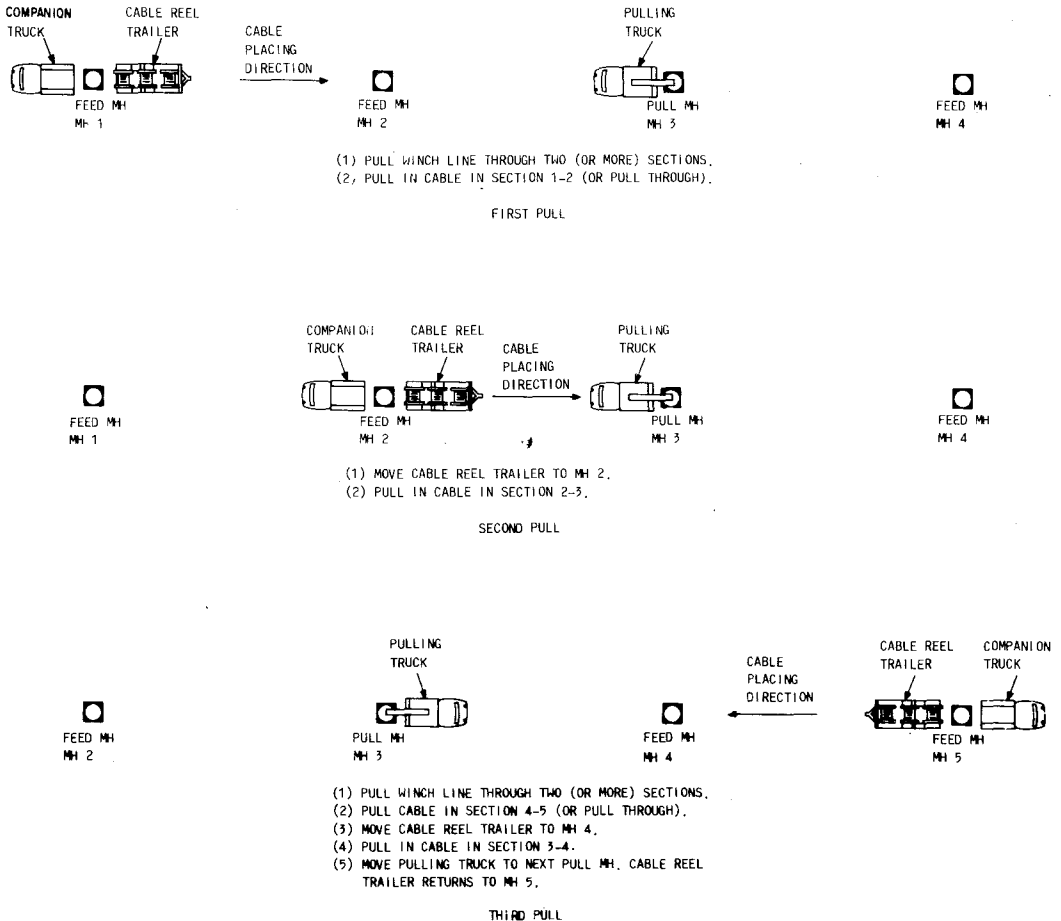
Method for Placing Cable With Conventional Equipment—Prewired Ducts
